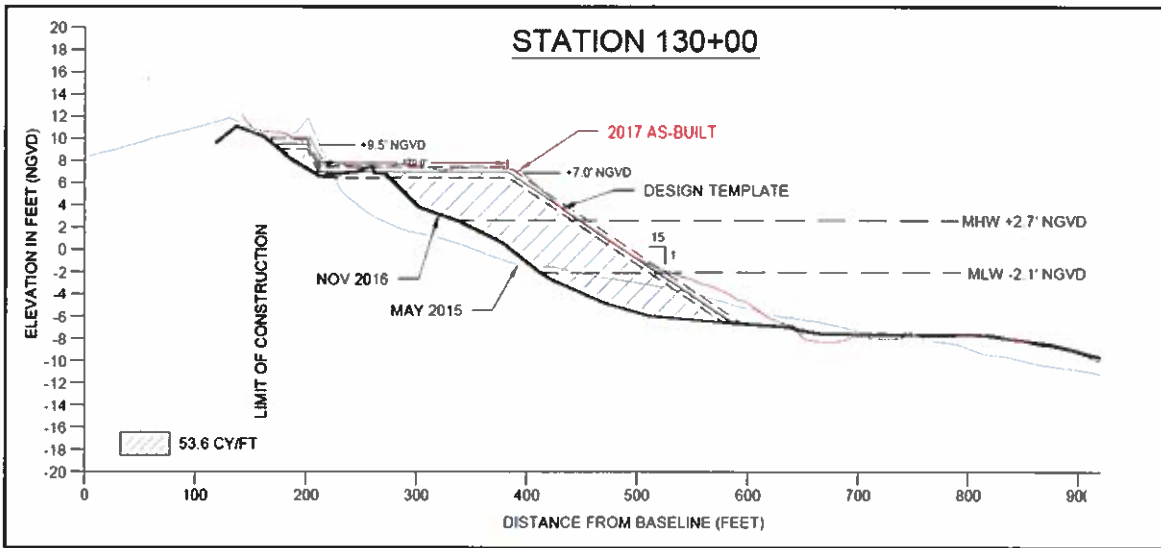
Typical "As Built" Cross Section following Central Reach Project Completion
